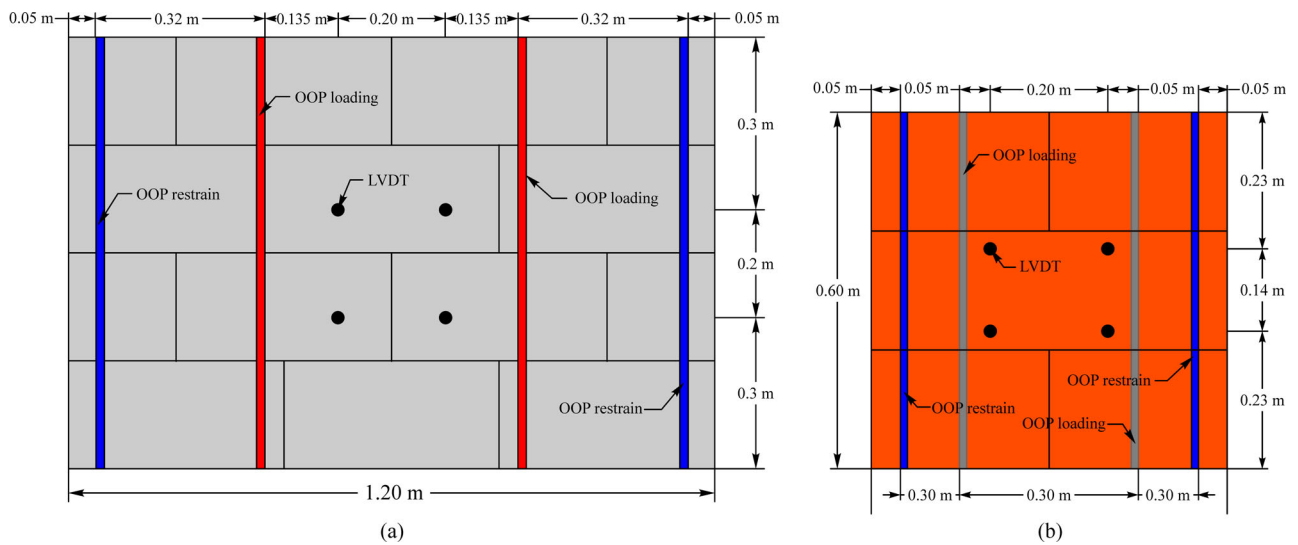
Flexural strength tests perpendicular to horizontal bed joints instrumentation and specimens' geometric dimensions: (a) VHCB315; (b) HCB110; HCB150; HCB150P10; HCHB150 (existing).
